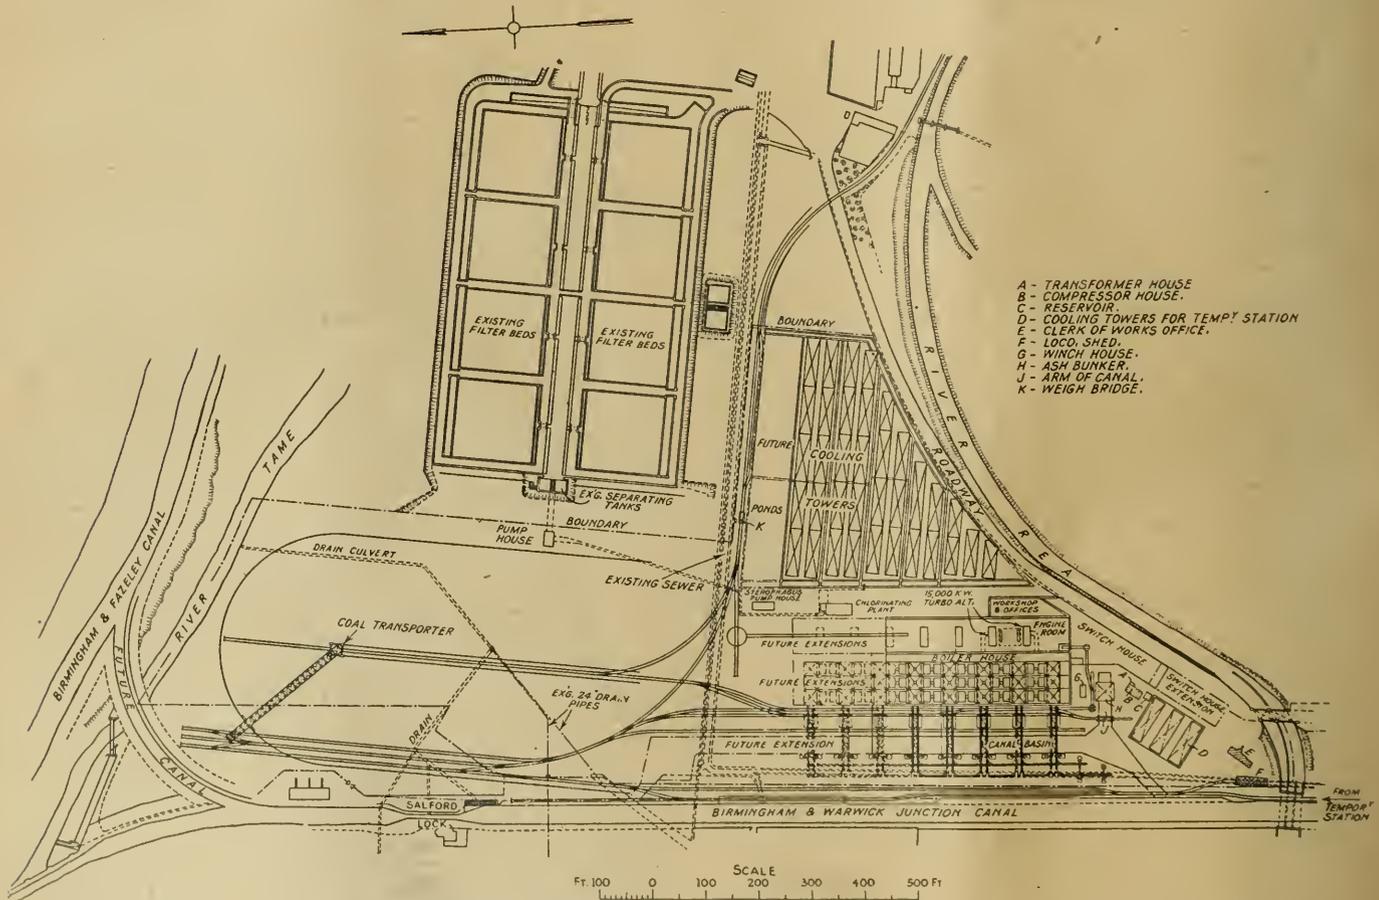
SITE PLAN OF THE NECHELLS STATION.
